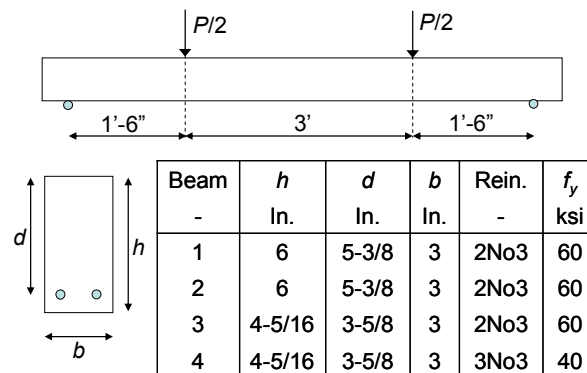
Details of beams (1 in= 25.4 mm, 1 ksi=6.89MPa, 1 kips= 4.448 kN, 1 lb/in=175 N/m)
